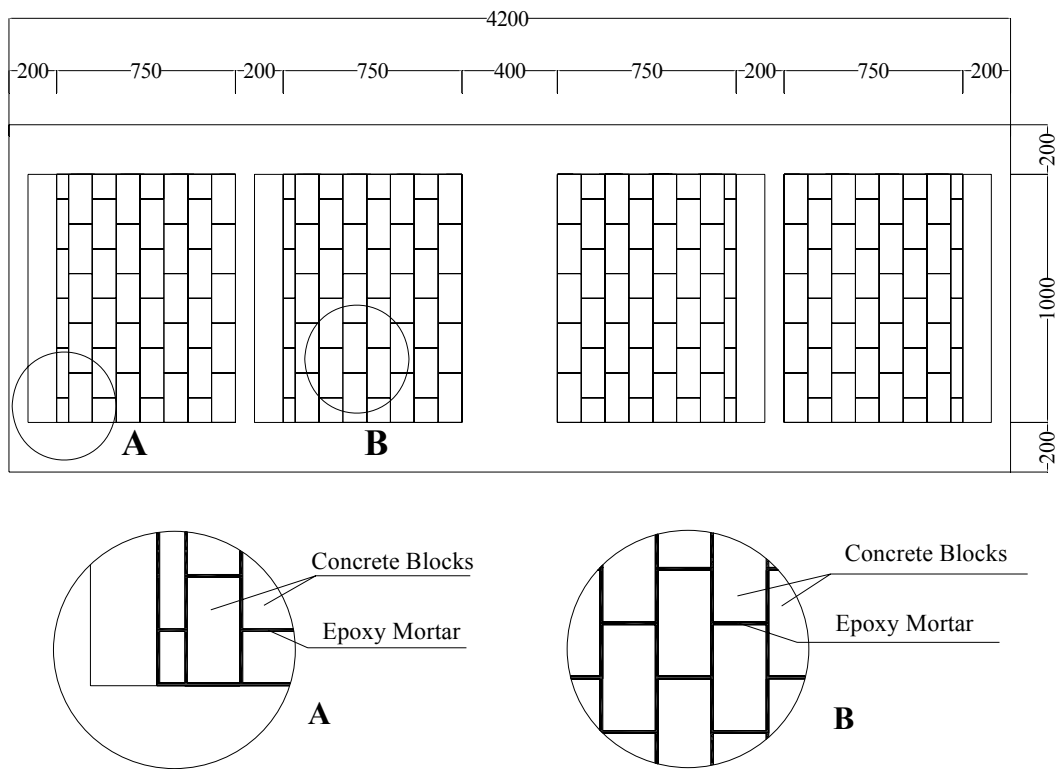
Specimen with Infill Wall Made of Rectangular Concrete Blocks
